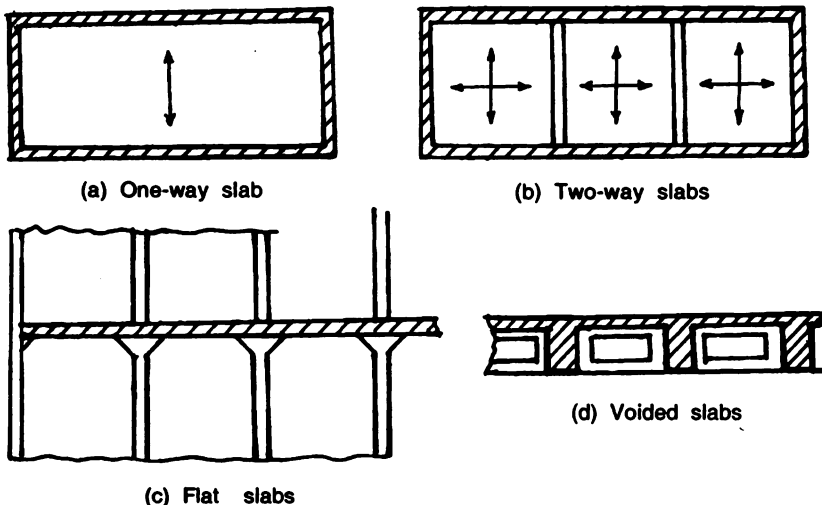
Common types of reinforced concrete floors and roofs.
